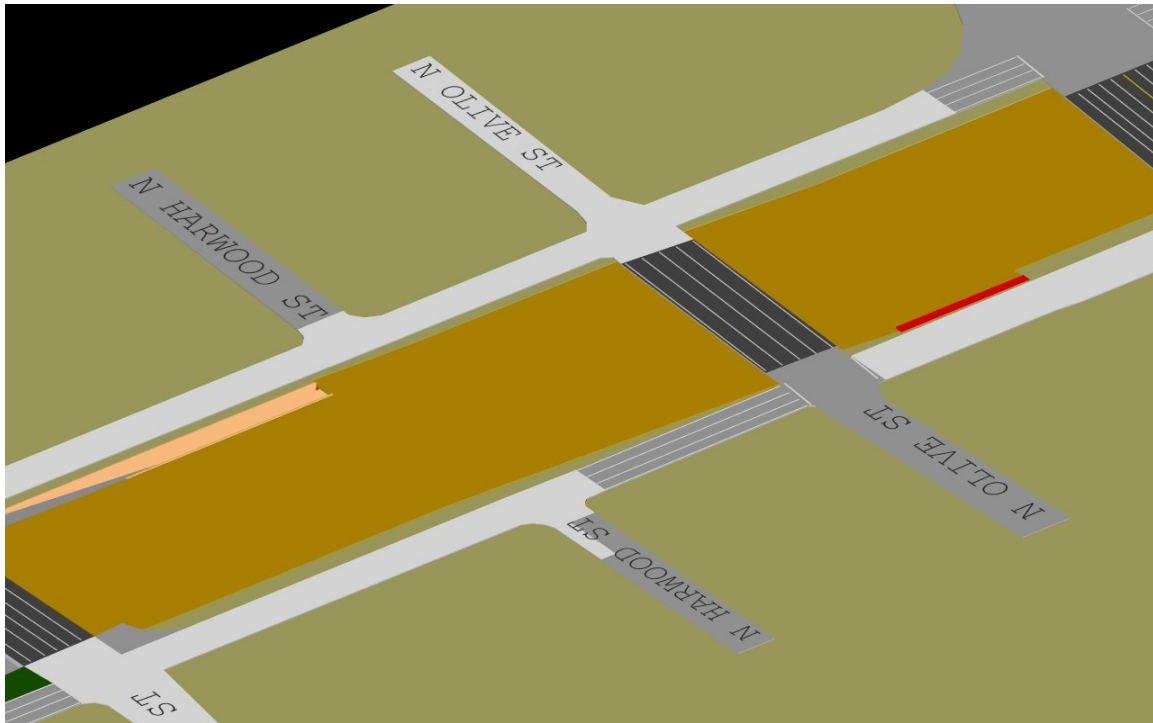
Construction of Park Fill, Irrigation, and Some Landscaping
